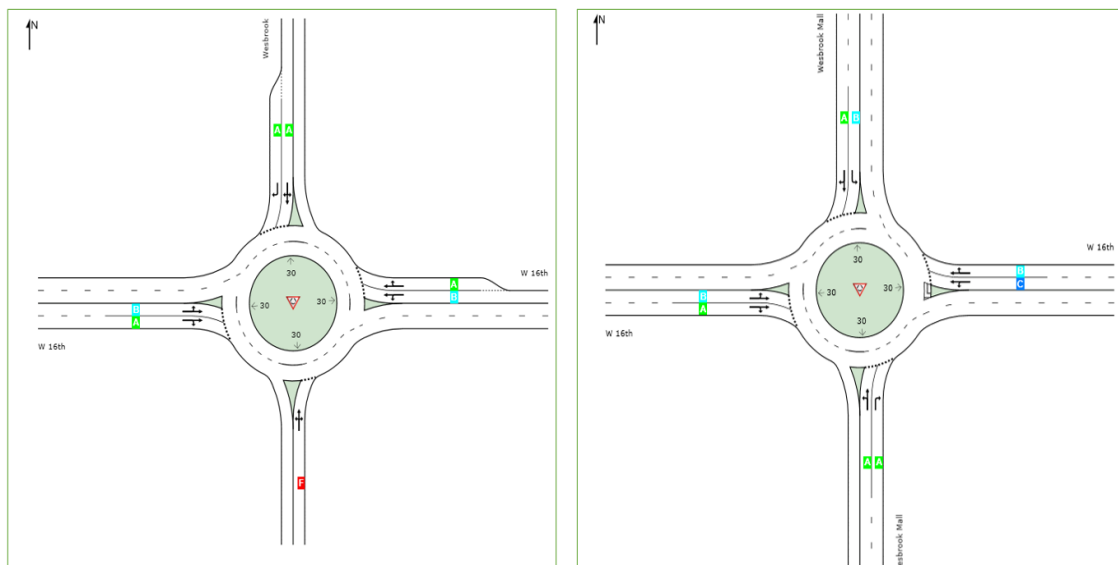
Existing Roundabout Layout (Left) and Modified Roundabout Design (Right)
